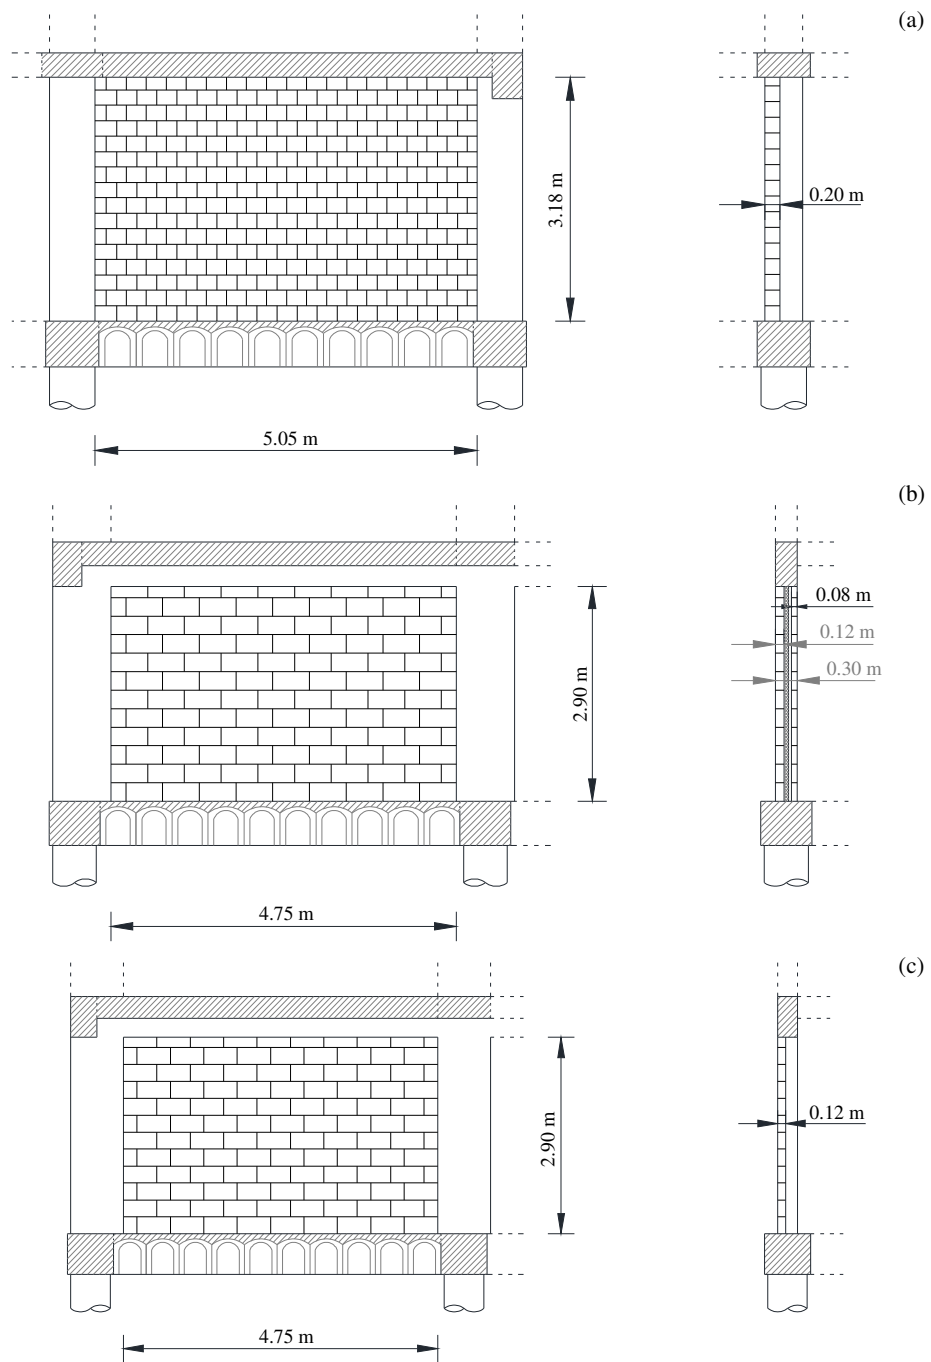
Geometry of the tested infill walls: (a) wall W1-F, (b) wall W2-F, (c) wall W3-F.
